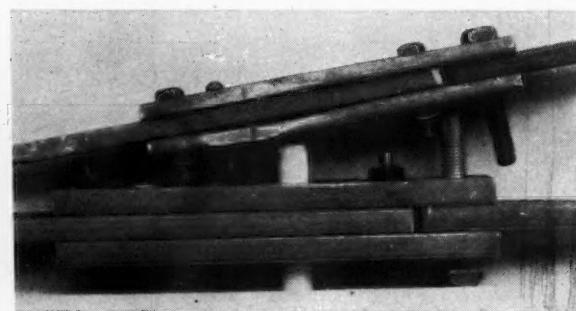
Two sets of three bars each having holes for pins of different diameters were used. The last test made in the upper set of bars was on a 5/8-in. machine bolt in the 3/4-in. hole. The 3/8-in. bars bent badly and the load went above 15,000 lb.
